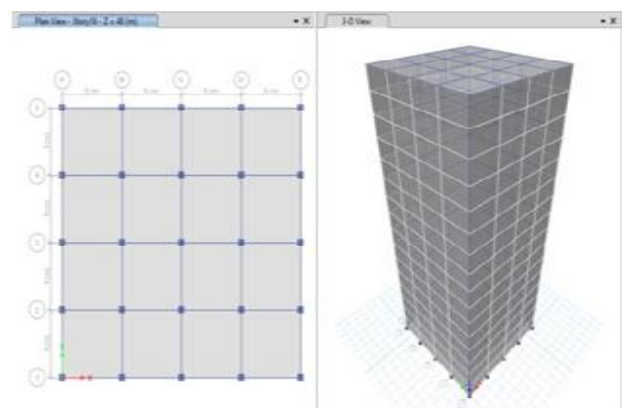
(Model 1) Plan and 3D view of the R.C. building taken for assessing the Wind Load.
